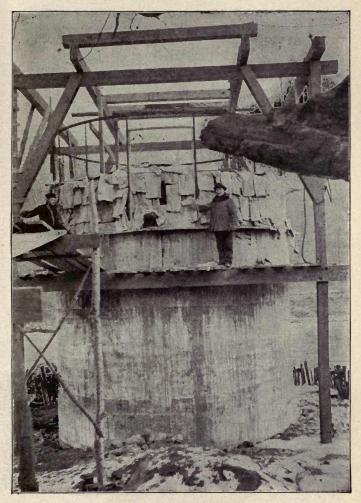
Construction of Intake Tank, LaSalle, Ill.
